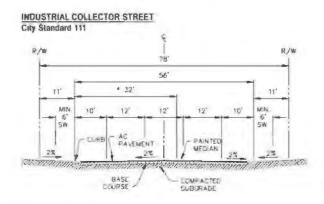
(10F2): CITY OF MURRIETA GENERAL PLAN ROADWAY CROSS-SECTIONS
